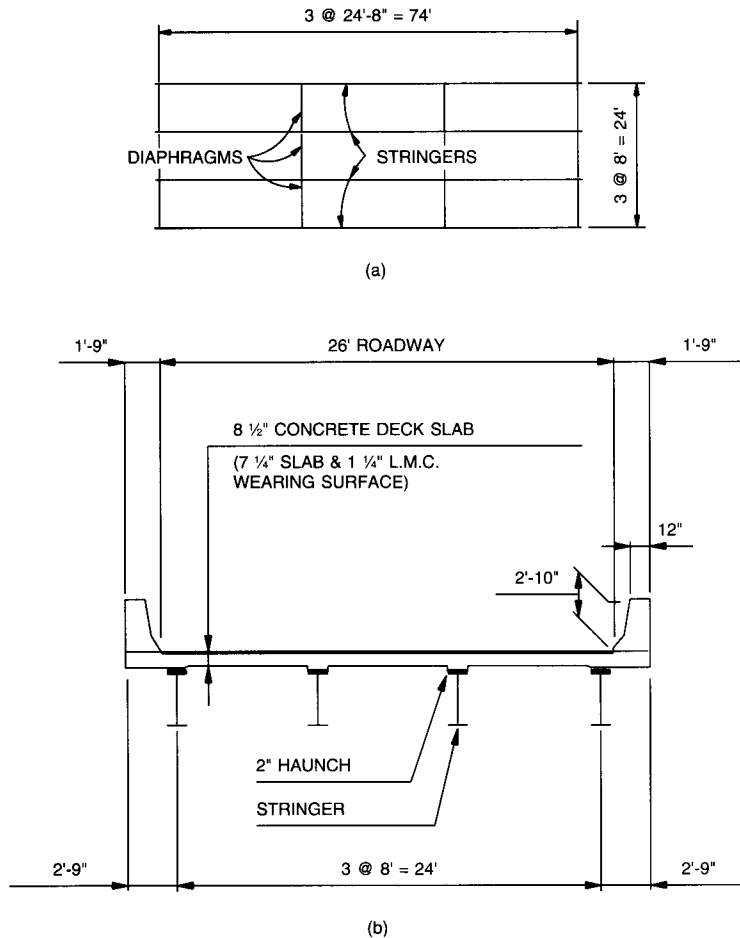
Two-lane highway bridge with rolled-beam stringers. (a) Framing plan. (b) Typical cross section.
